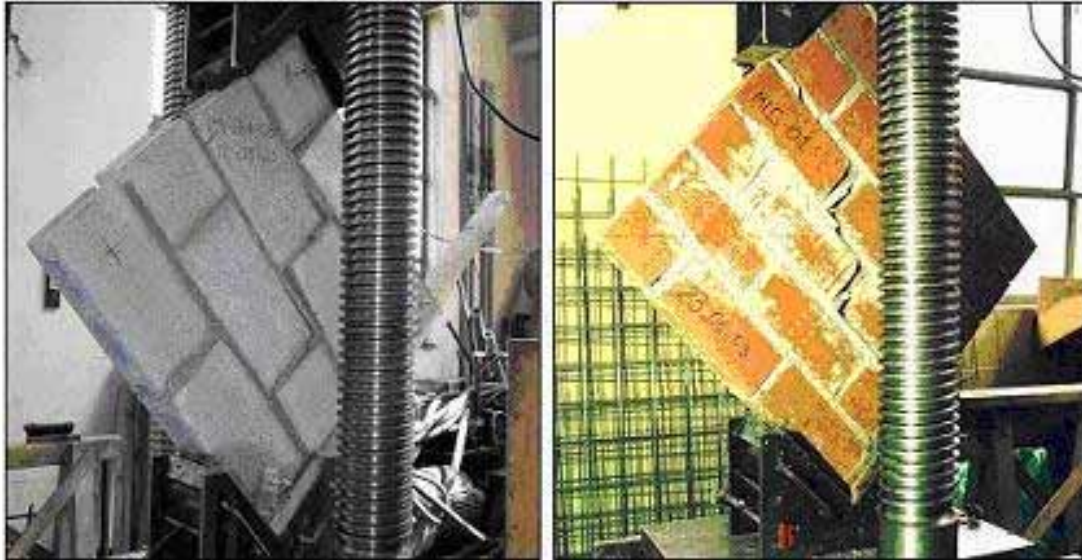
Diagonal compression test of masonry wall segments of concrete masonry units (left) and hollow clay brick masonry units (right). It can be seen in both cases that the cracks propagate through the mortar joint
